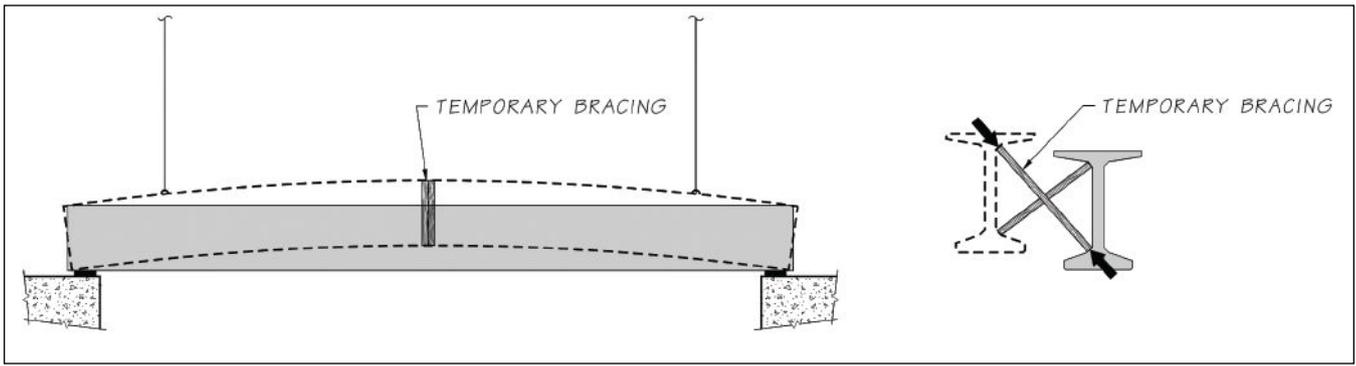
Elevation view of girders showing differential camber at erection and section of adjacent girders showing bracing geometry and forces.
